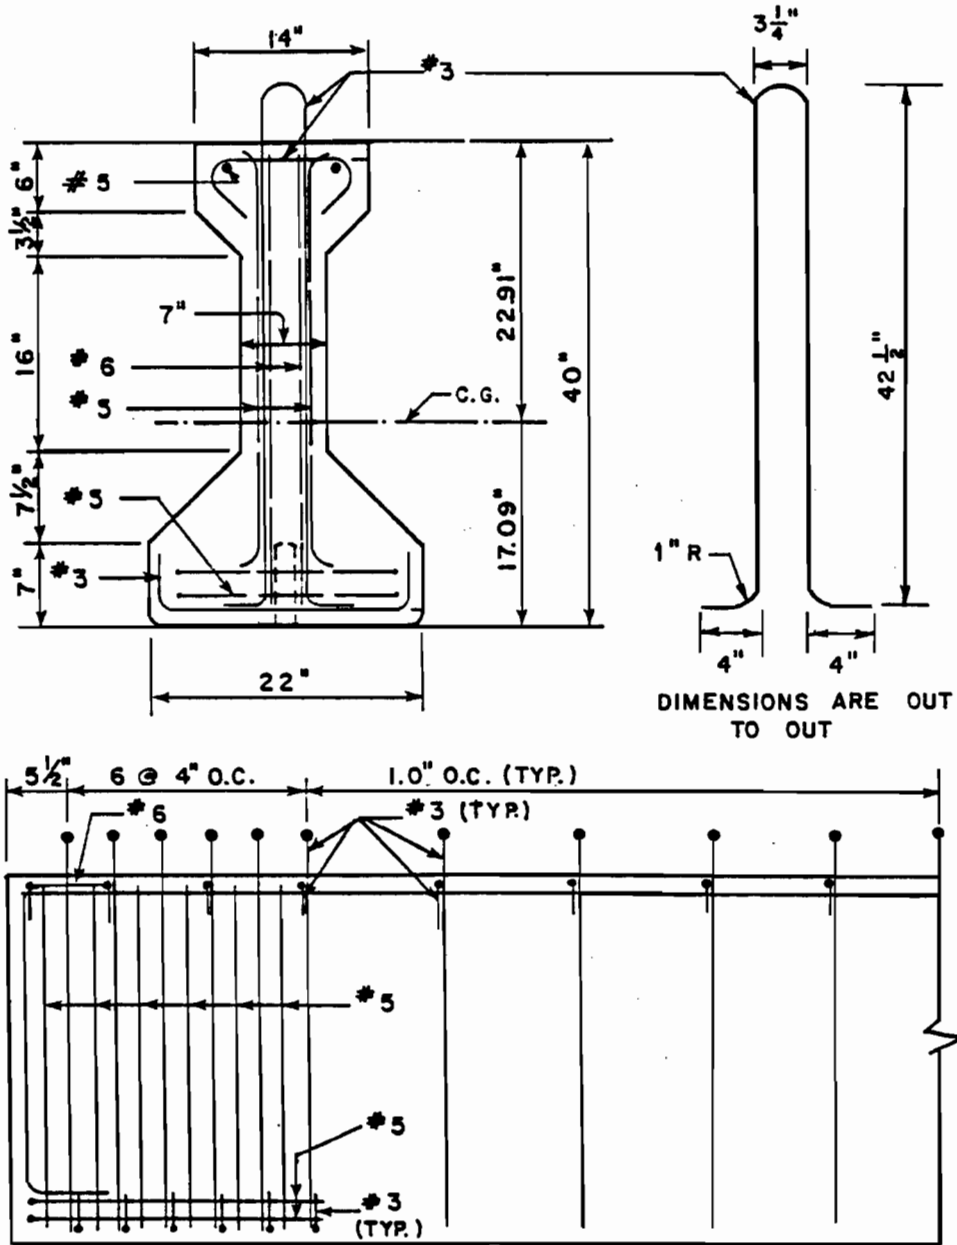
Shear and confining reinforcement, and stirrup dimensions for a Texas Type C girder
